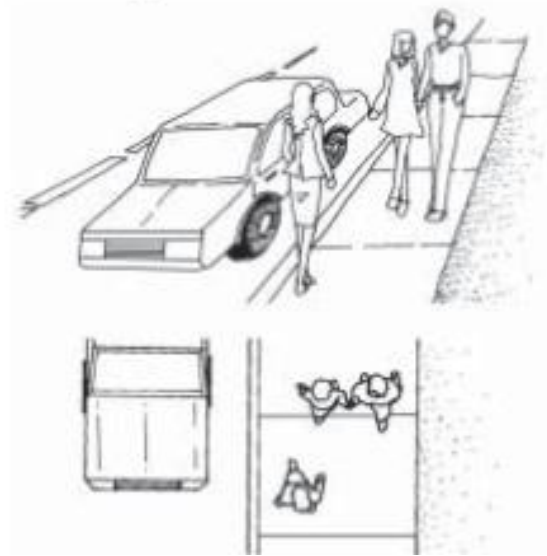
Passing standards for sidewalk (Pedestrian & Streetscape Guide, 2003, Figure 4)
